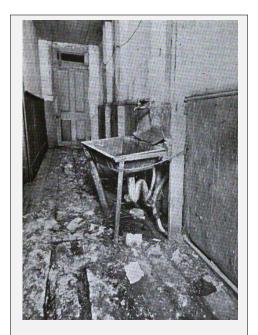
Public hall and sink. Sink supported only by string and flimsy wooden props. Hall floor covered with fecal matter and sewage. (1903)
